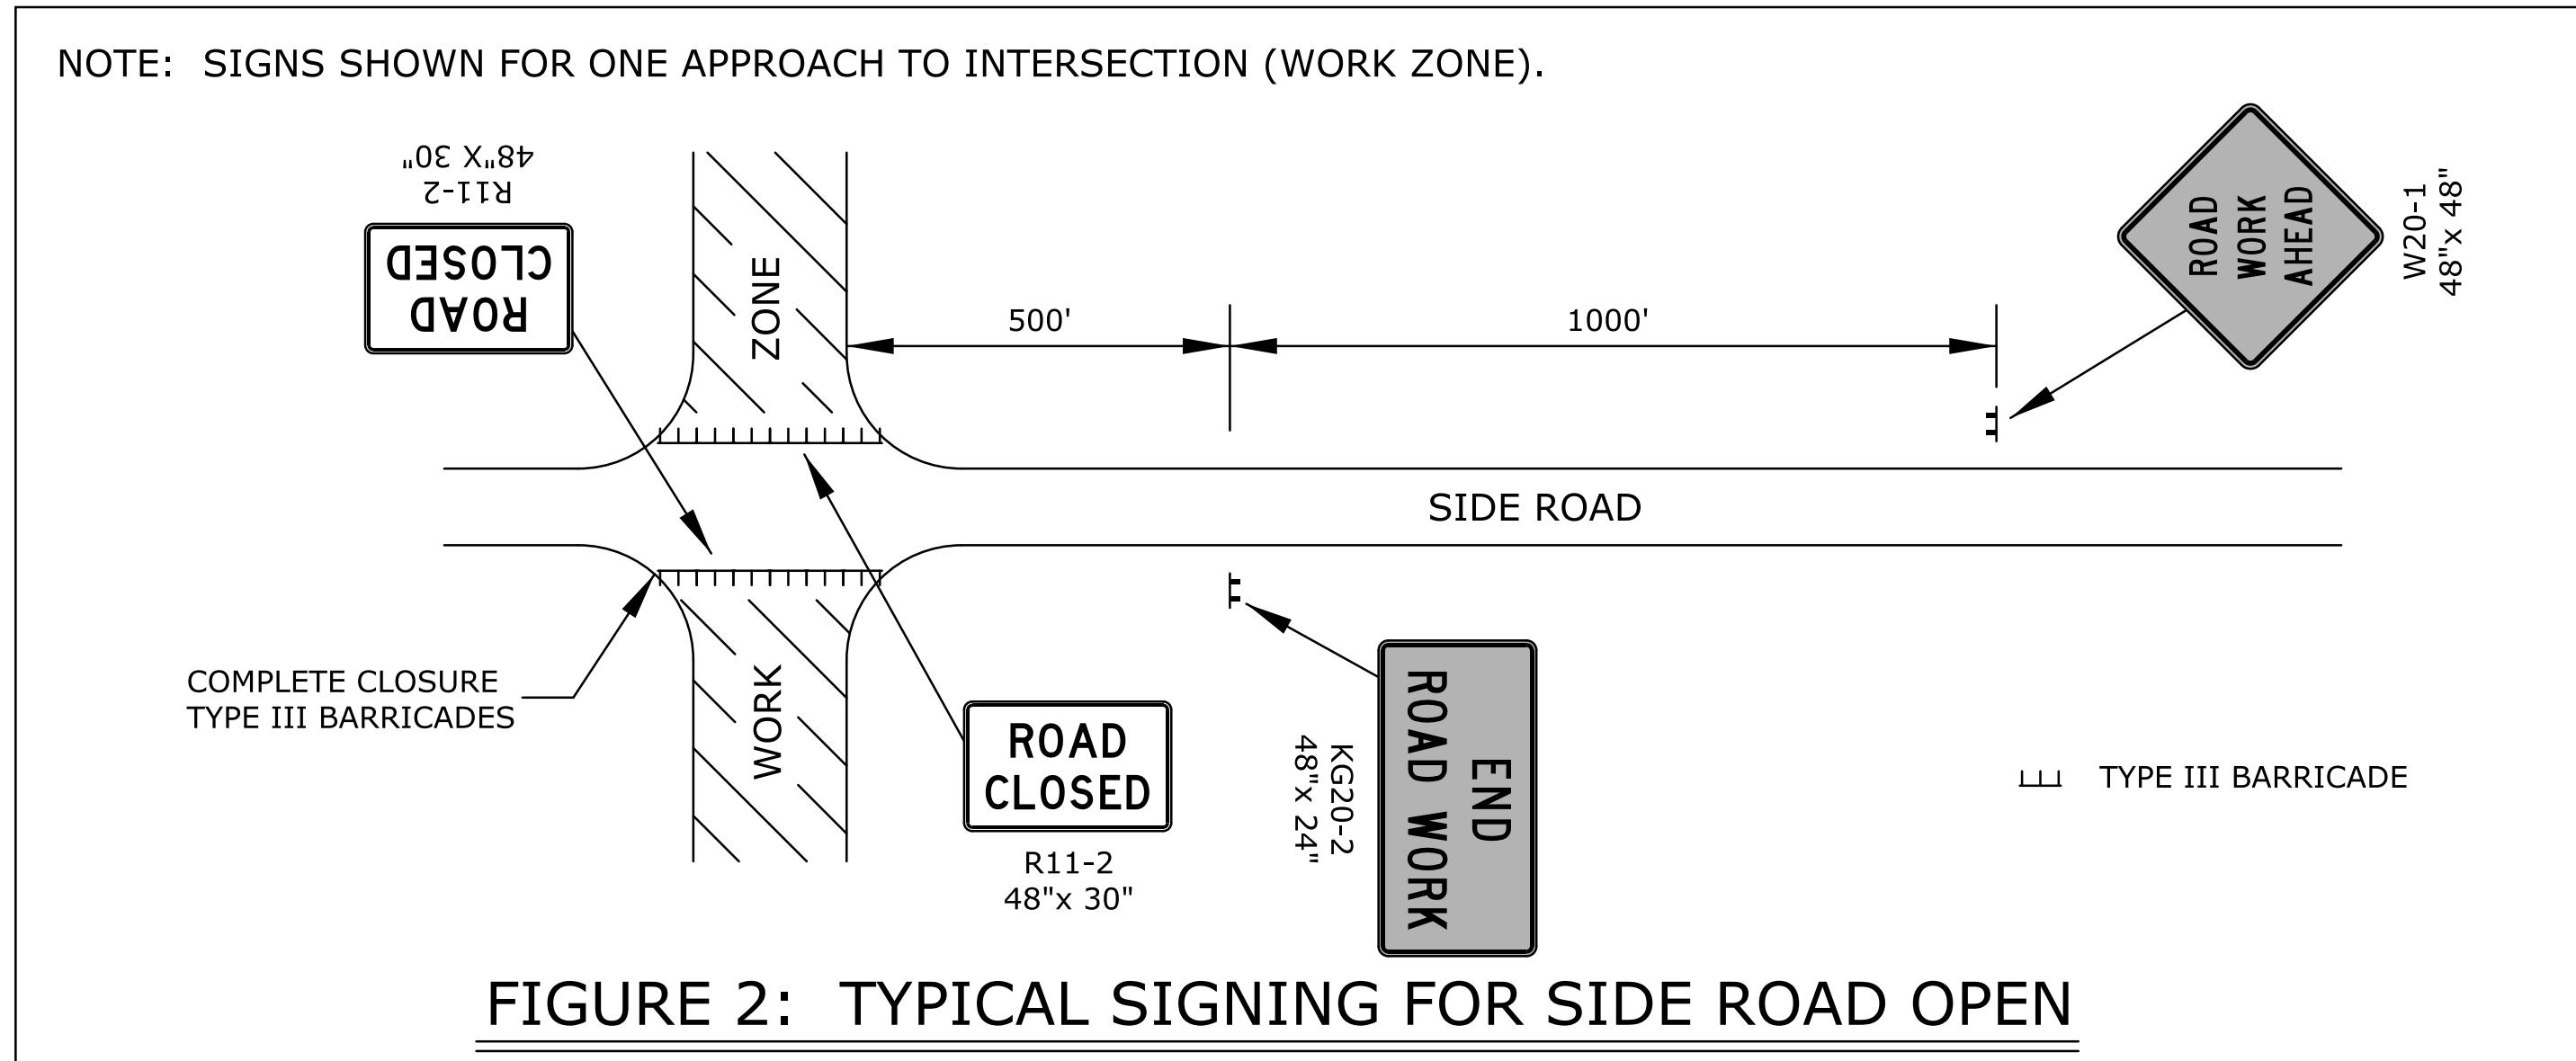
TYPICAL SIGNING FOR SIDE ROAD OPEN
